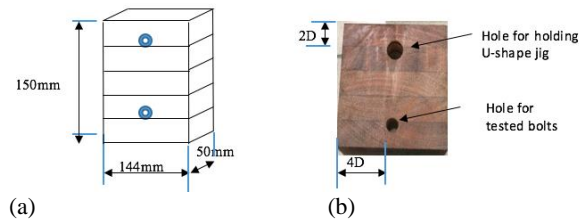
The two holes on each specimen (a) block dimension, (b) minimum end and edge distance.
